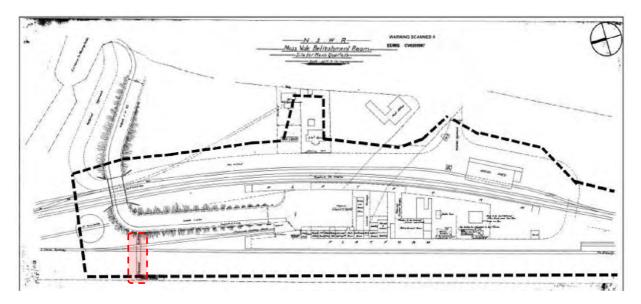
Plan of the station layout in 1915 showing the Lackey Road footbridge as 'proposed' (highlighted in red). (Source: CMP 2020)
